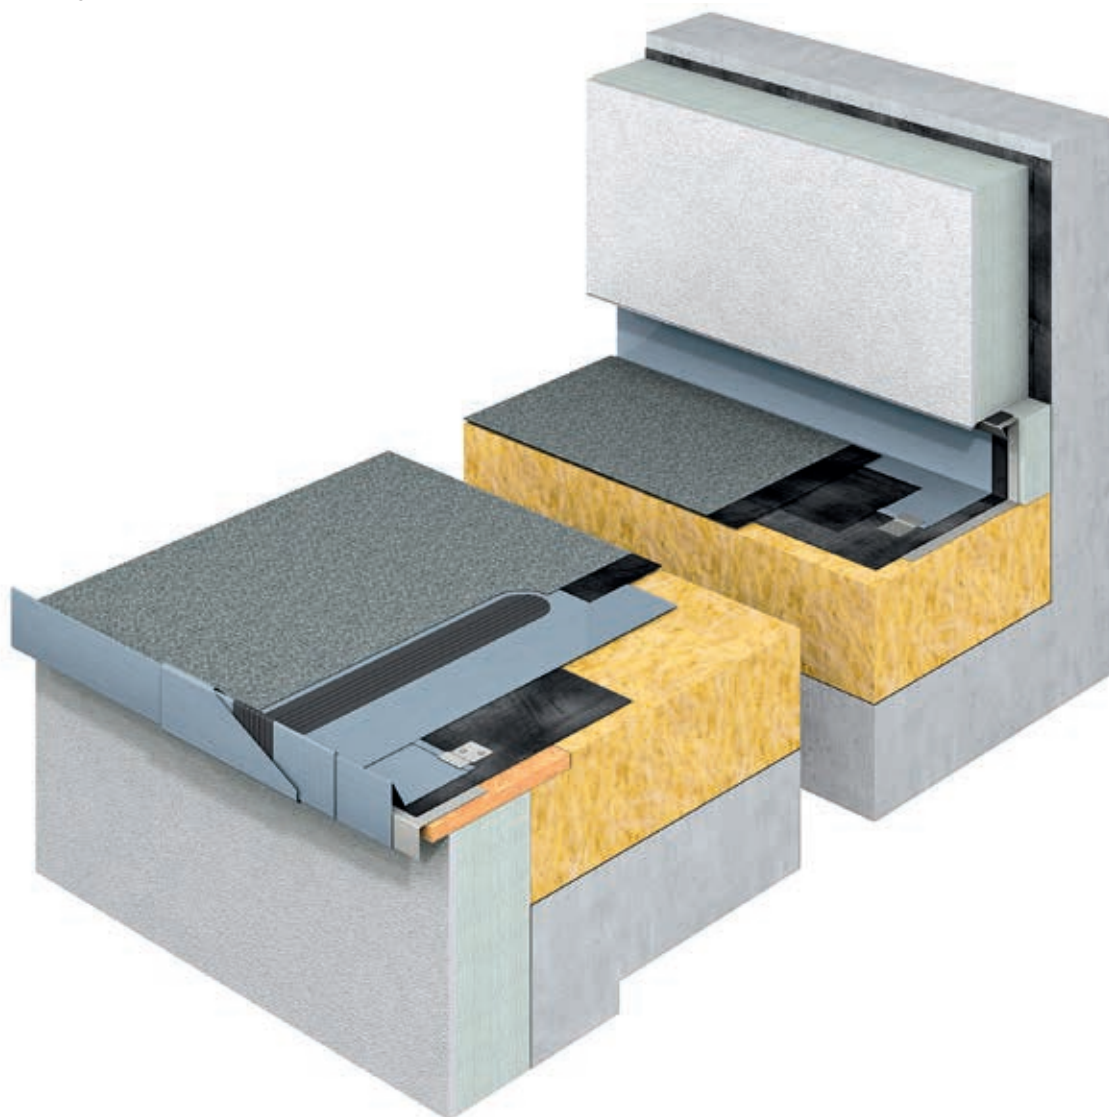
Roof edge with a sealing function and internal drainage with connection to vertical wall
